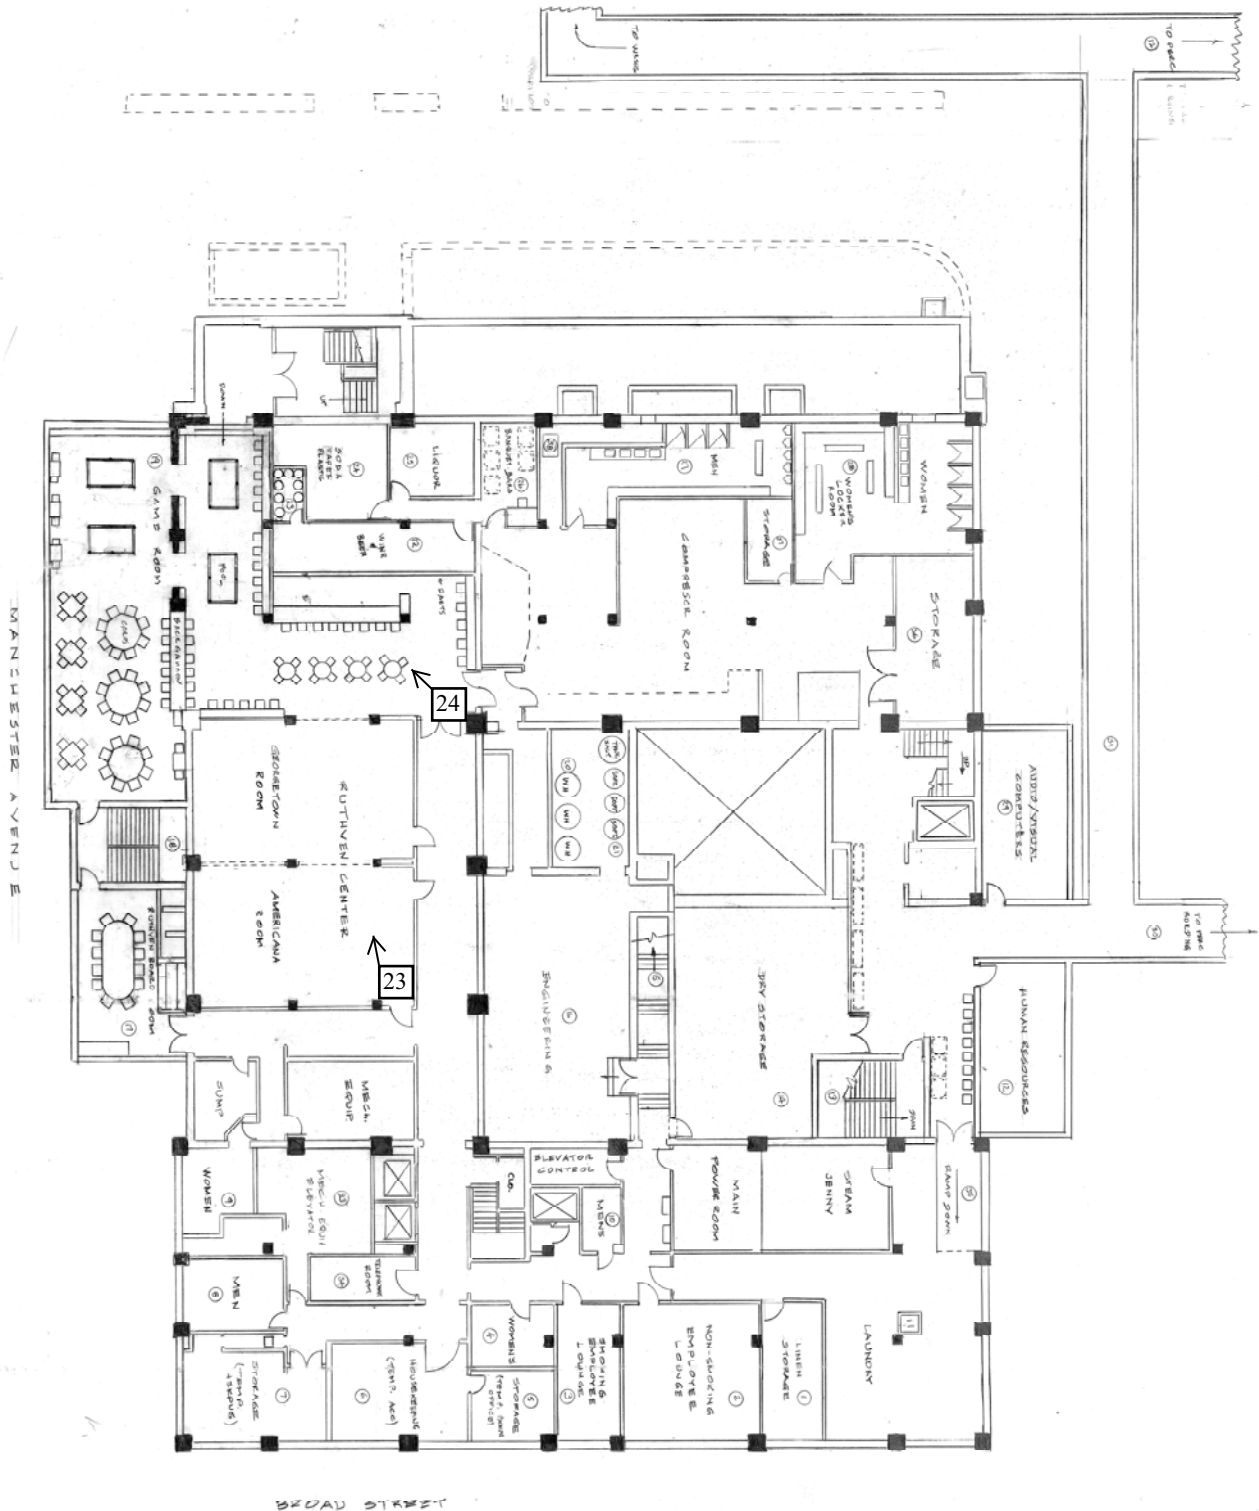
Floor plan of Basement of the Hotel Manchester in Middletown, Ohio with photo locations
